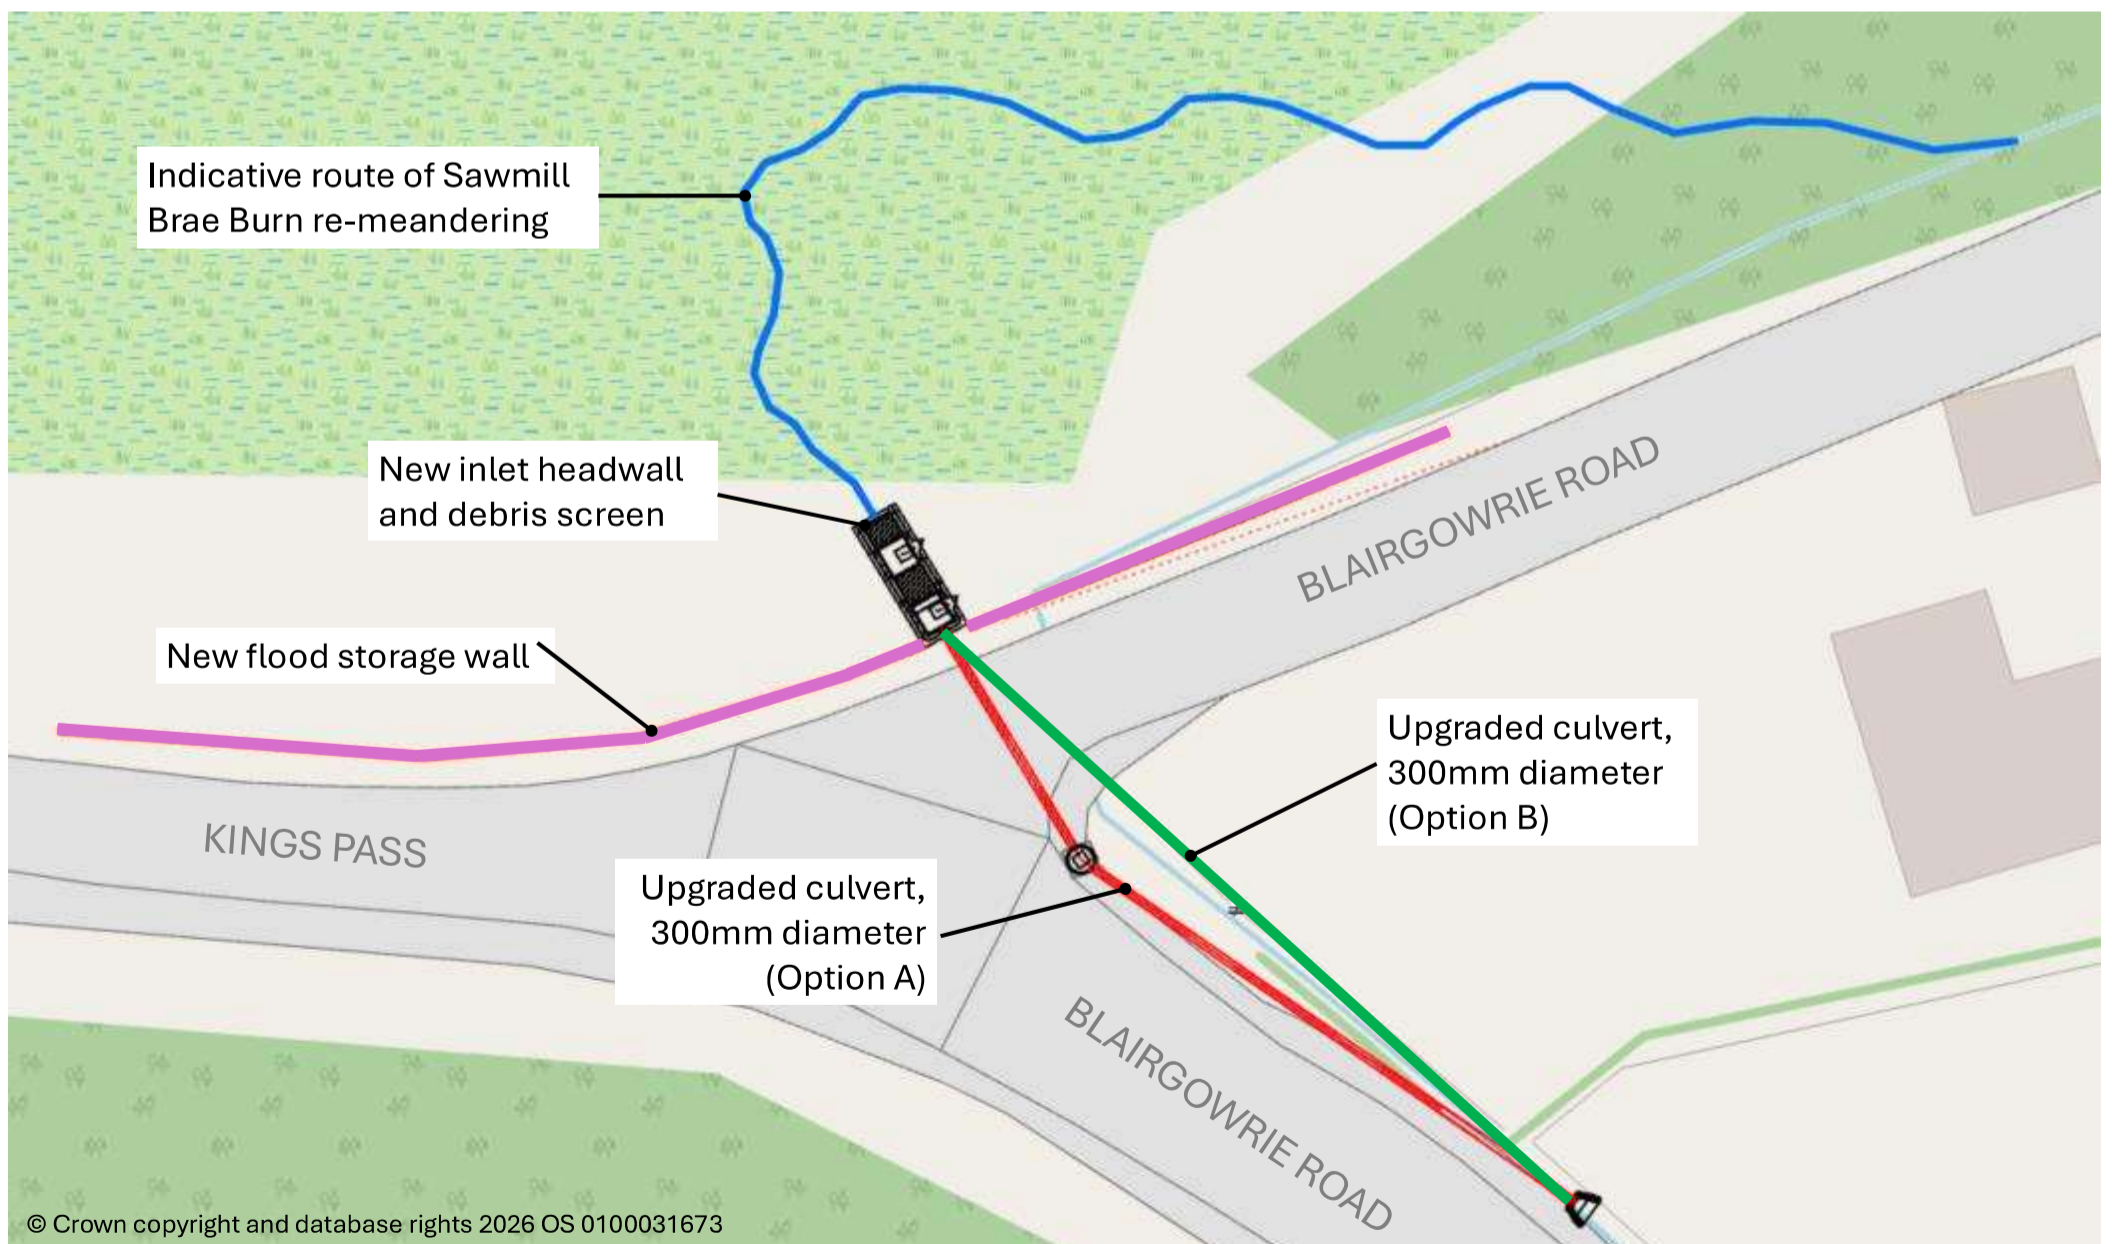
Proposed flood storage wall, upgraded culvert options and burn re-meandering at Work Area 2
